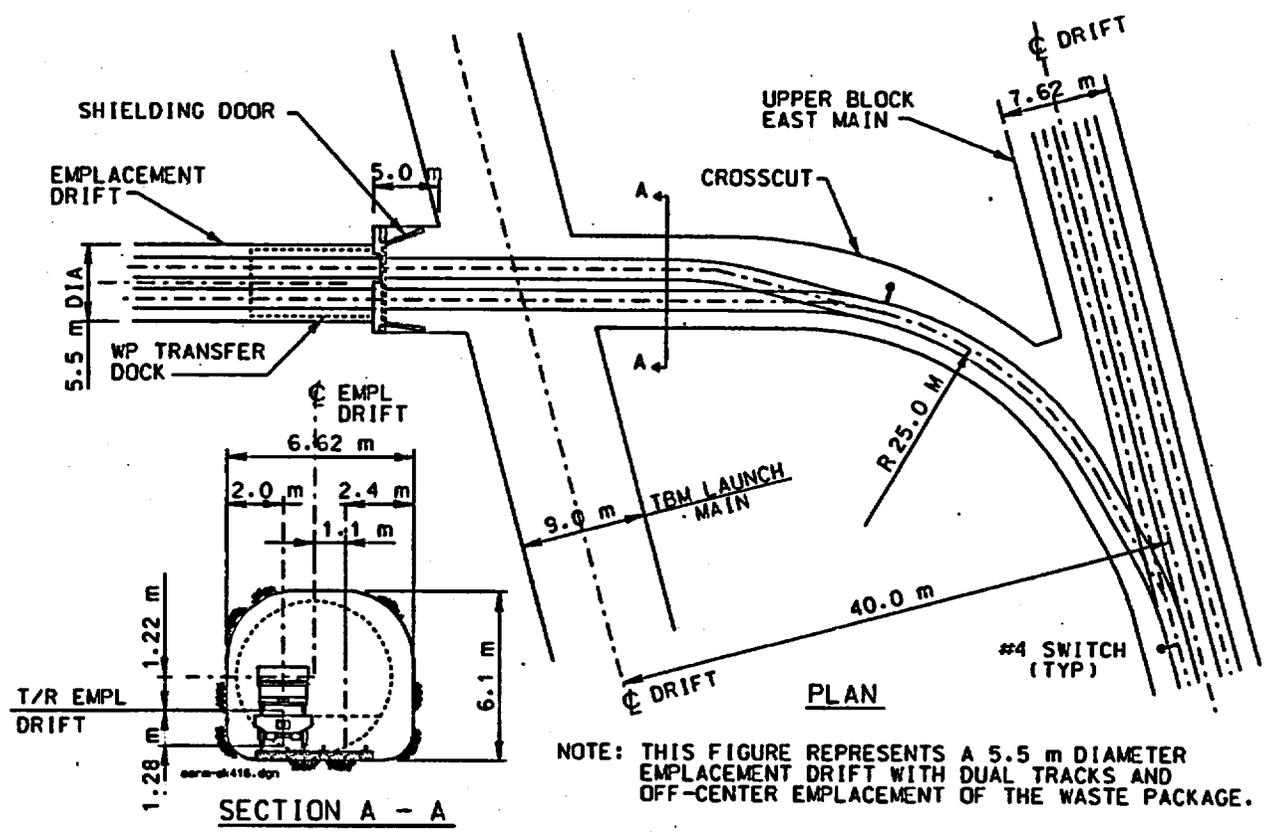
Typical Track and Switch Layout at Upper Block East Side for 5.5 m Diameter Emplacement Drift Entrance
